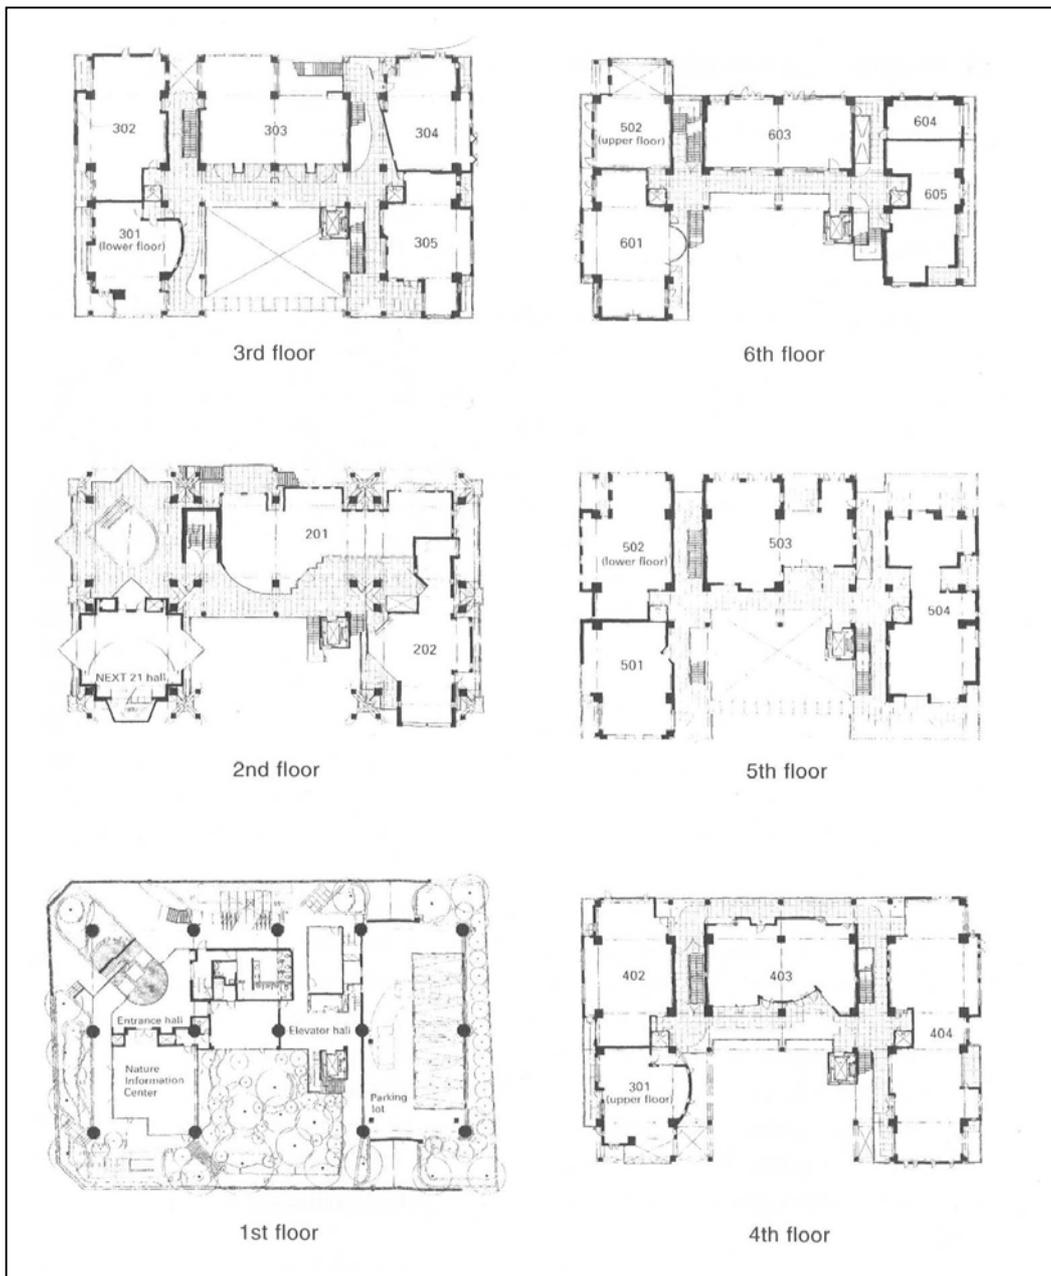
Floor plans of Next 21 project (Kendall & Teicher, 2000).
